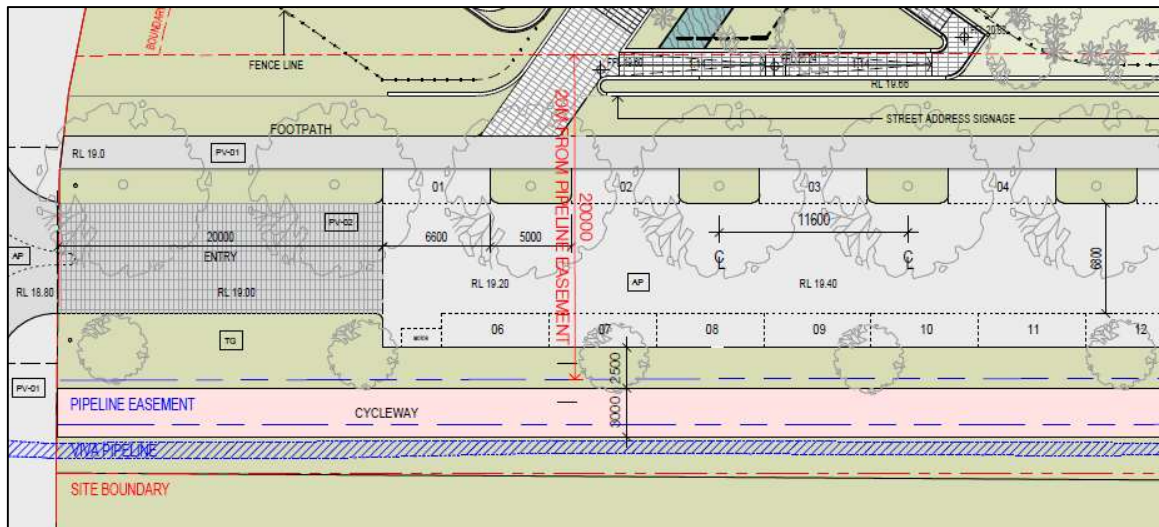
Proposed new road – location of easements for pipeline shown in blue
